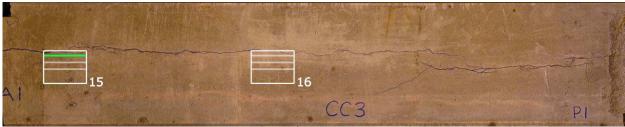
Location of 2<sup>nd</sup> Layer Punch outs on Beam CC3
